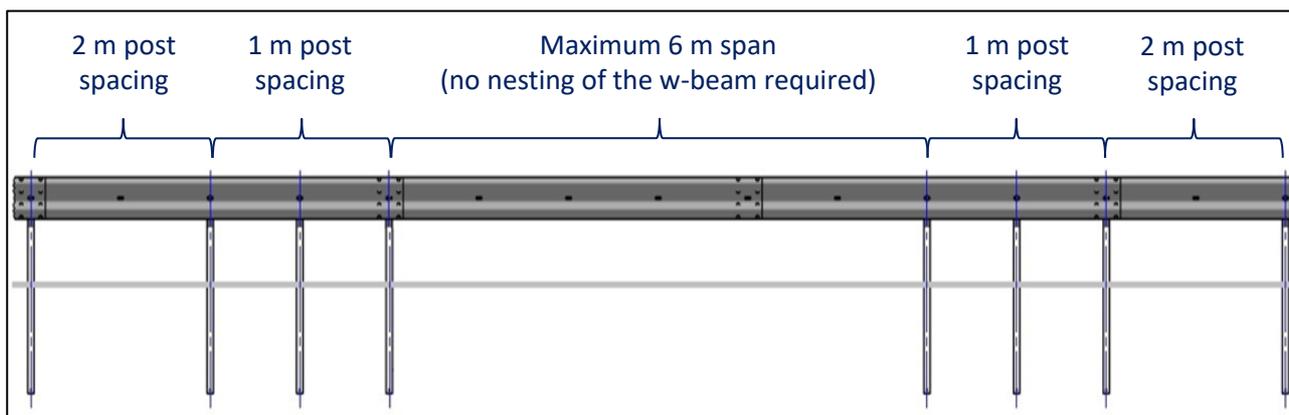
RamShield® W-Beam, 6 m Span without Posts.
